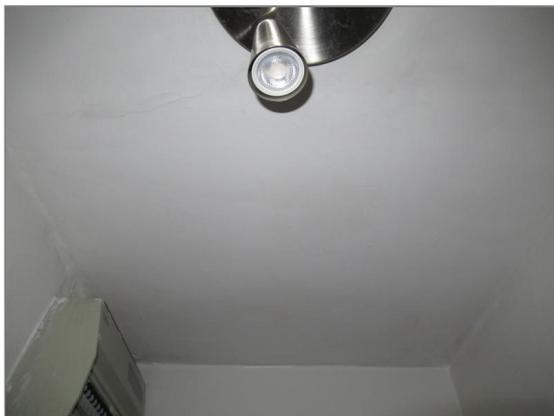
Sporadic cracking to hallway ceiling - pic 1
